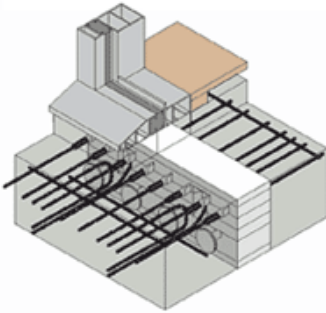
Detail of wall/floor junction, a typical point for thermal bridging
